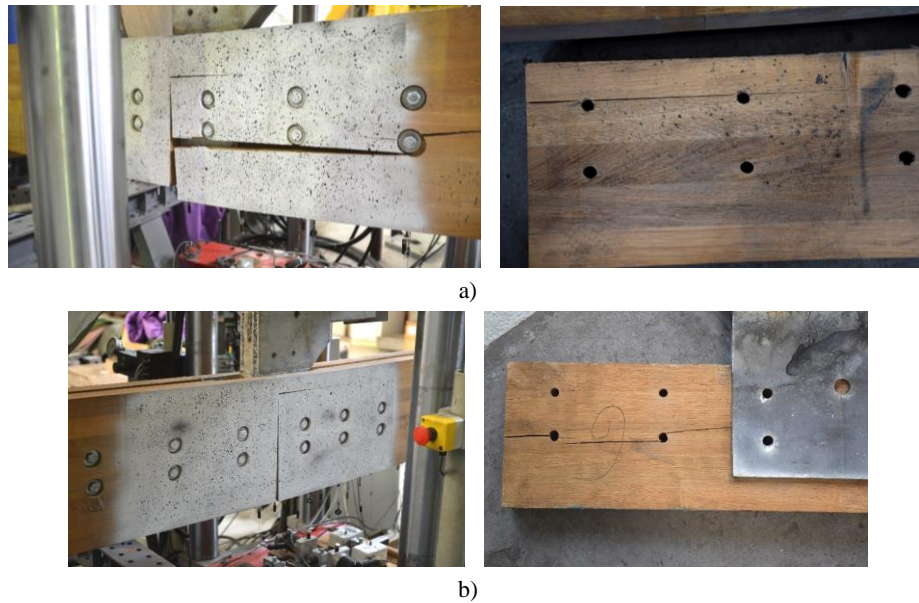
Failure mode: a) specimen S3; b) specimen S4.
